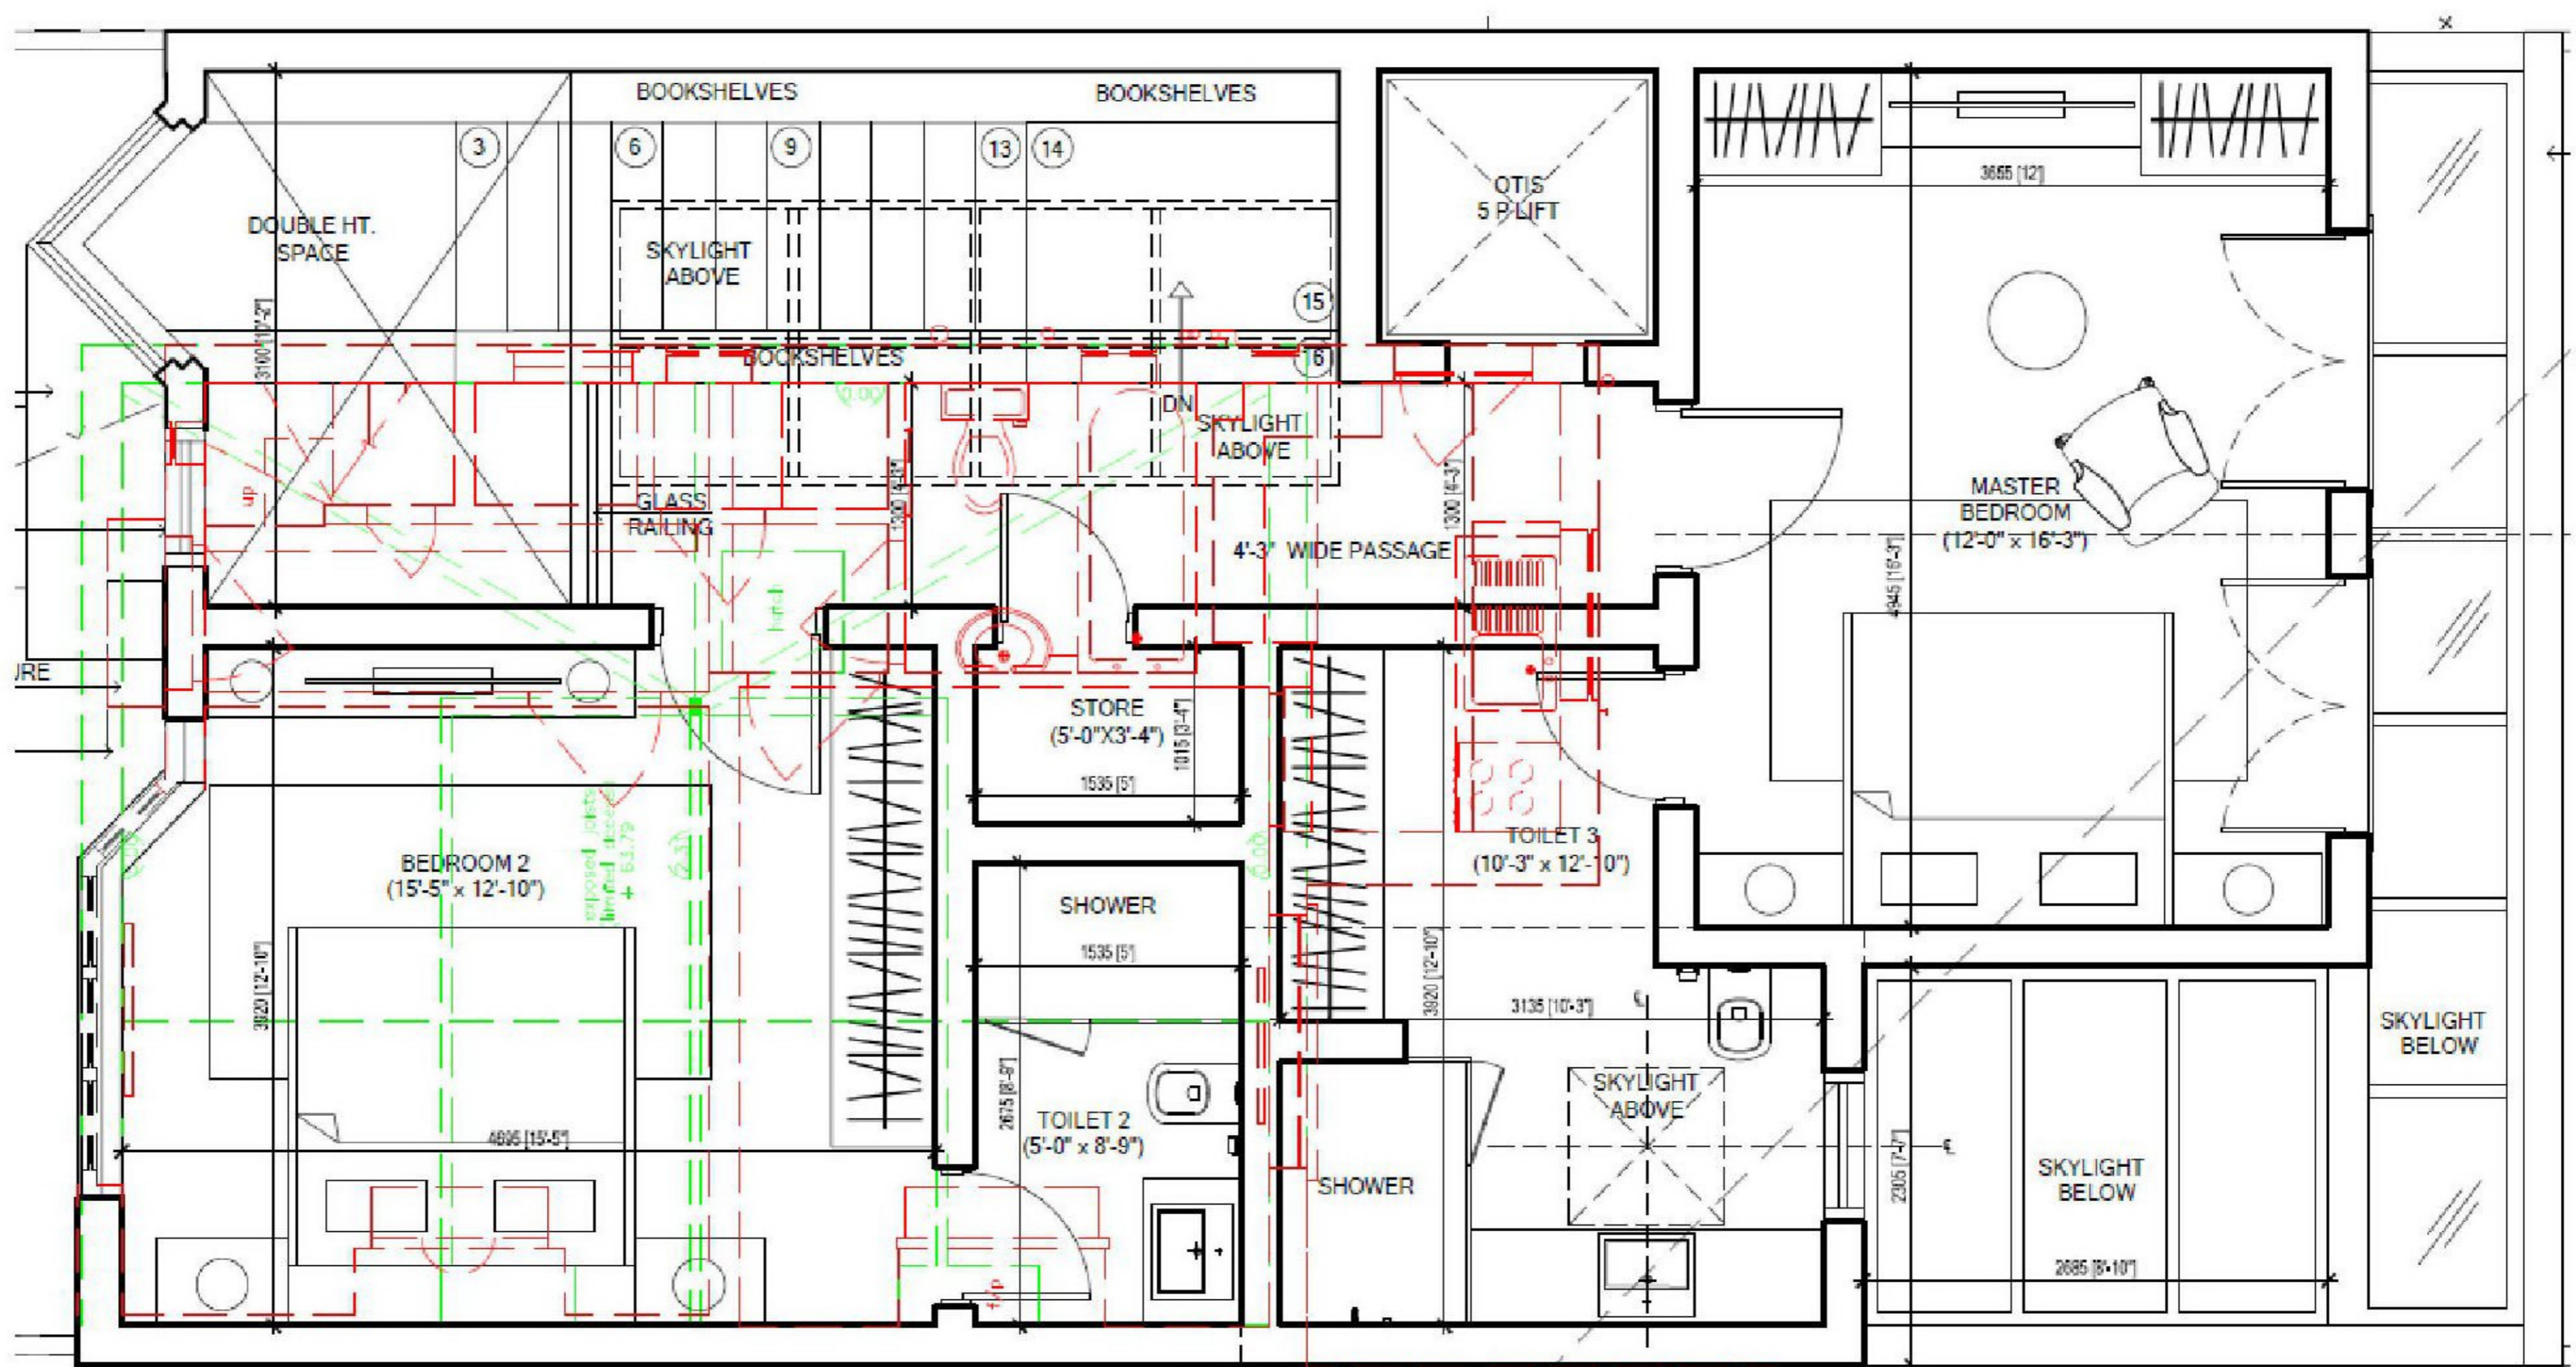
First floor plan for the proposed extension at 41 Meadow Prospect. The contour of the existing property is shown in red. Based on plan by Abhimanyu Dalal Architects.
